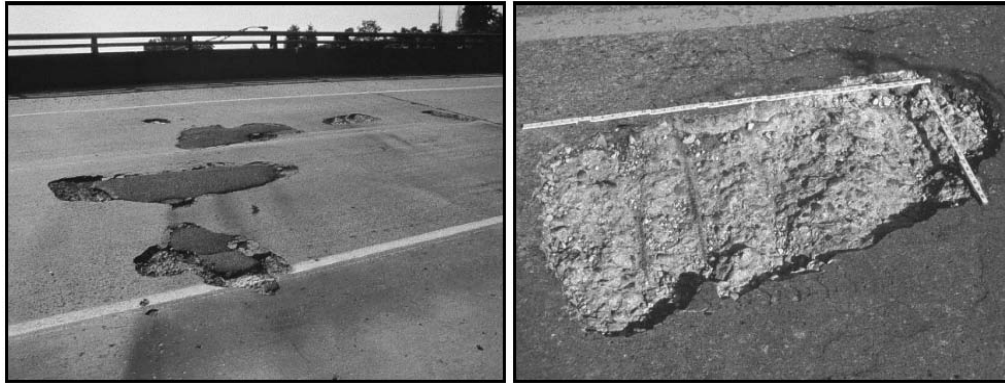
Spalls and distressed patches in Span 4 deck
